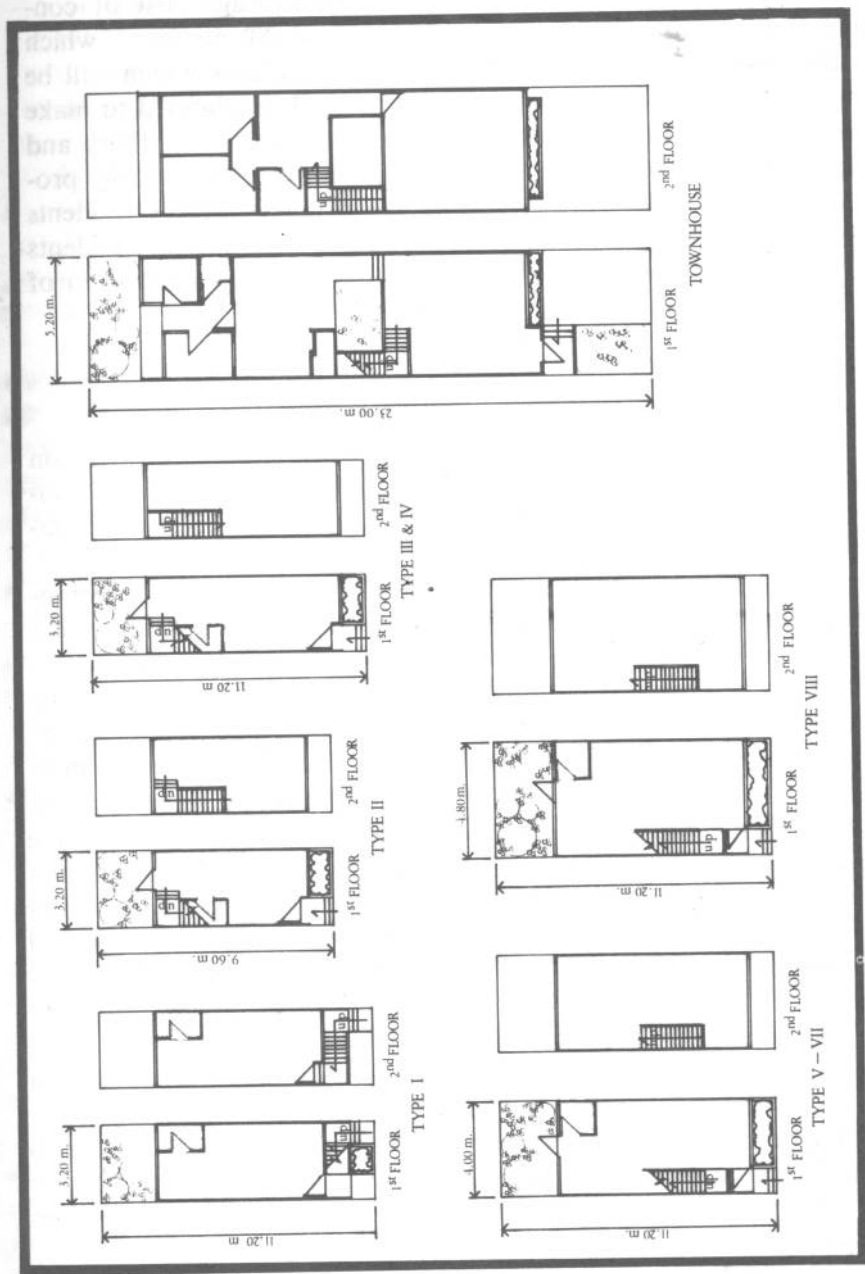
House types in the Soi Bhavana slum reconstruction project, Bangkok, 1981
